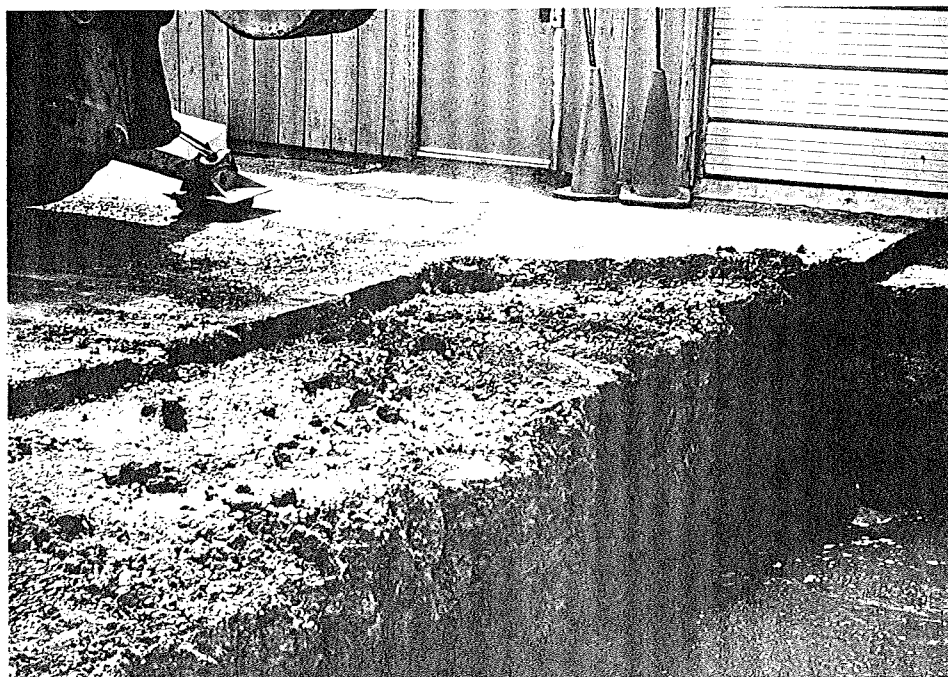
First Phase excavation continued under concrete slab to east and under dispenser area, conducted by Jackie E. Stephens
